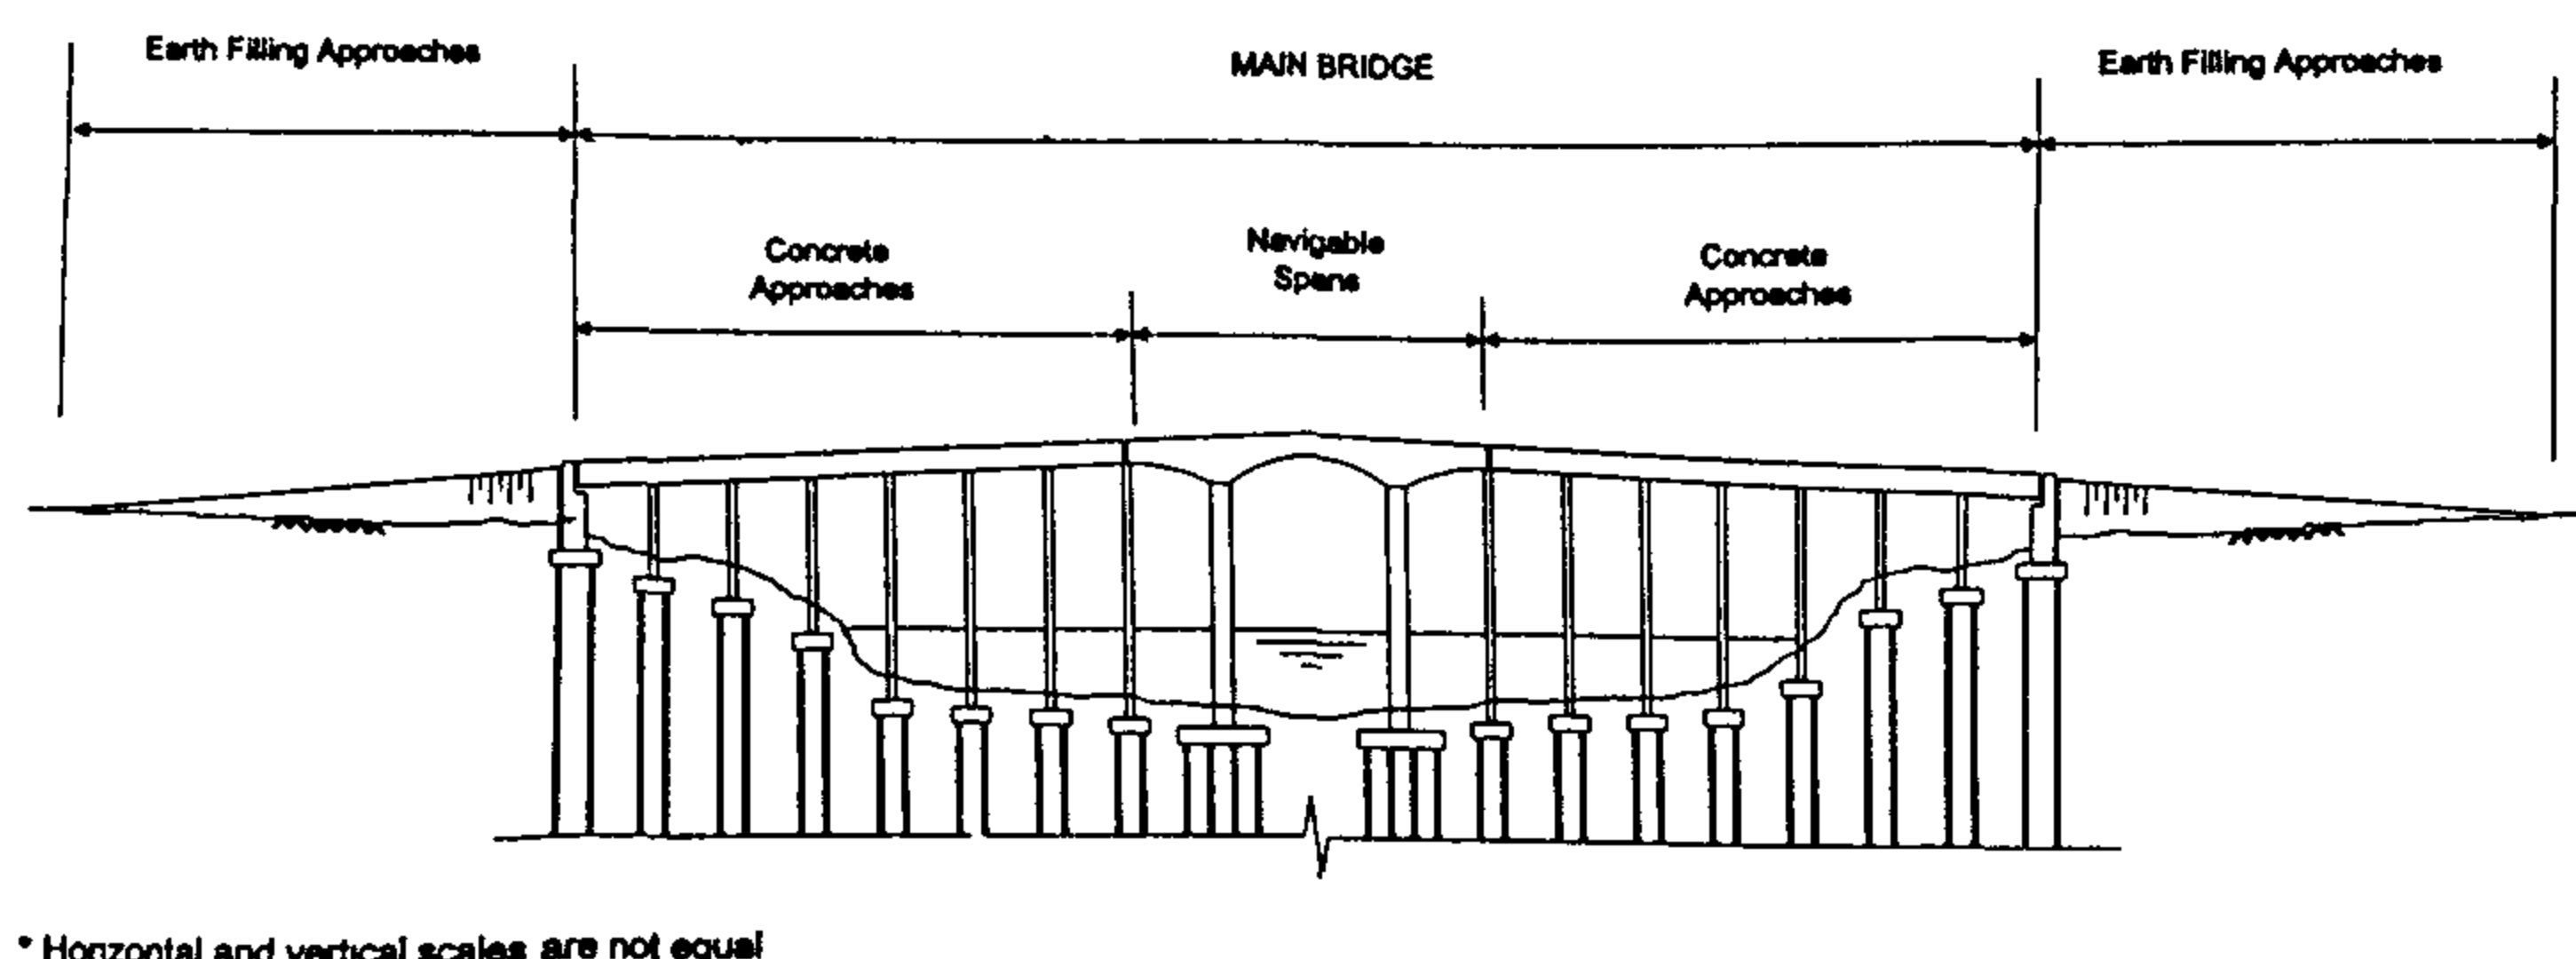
Typical profile of prestressed concrete bridge over the Nile.
